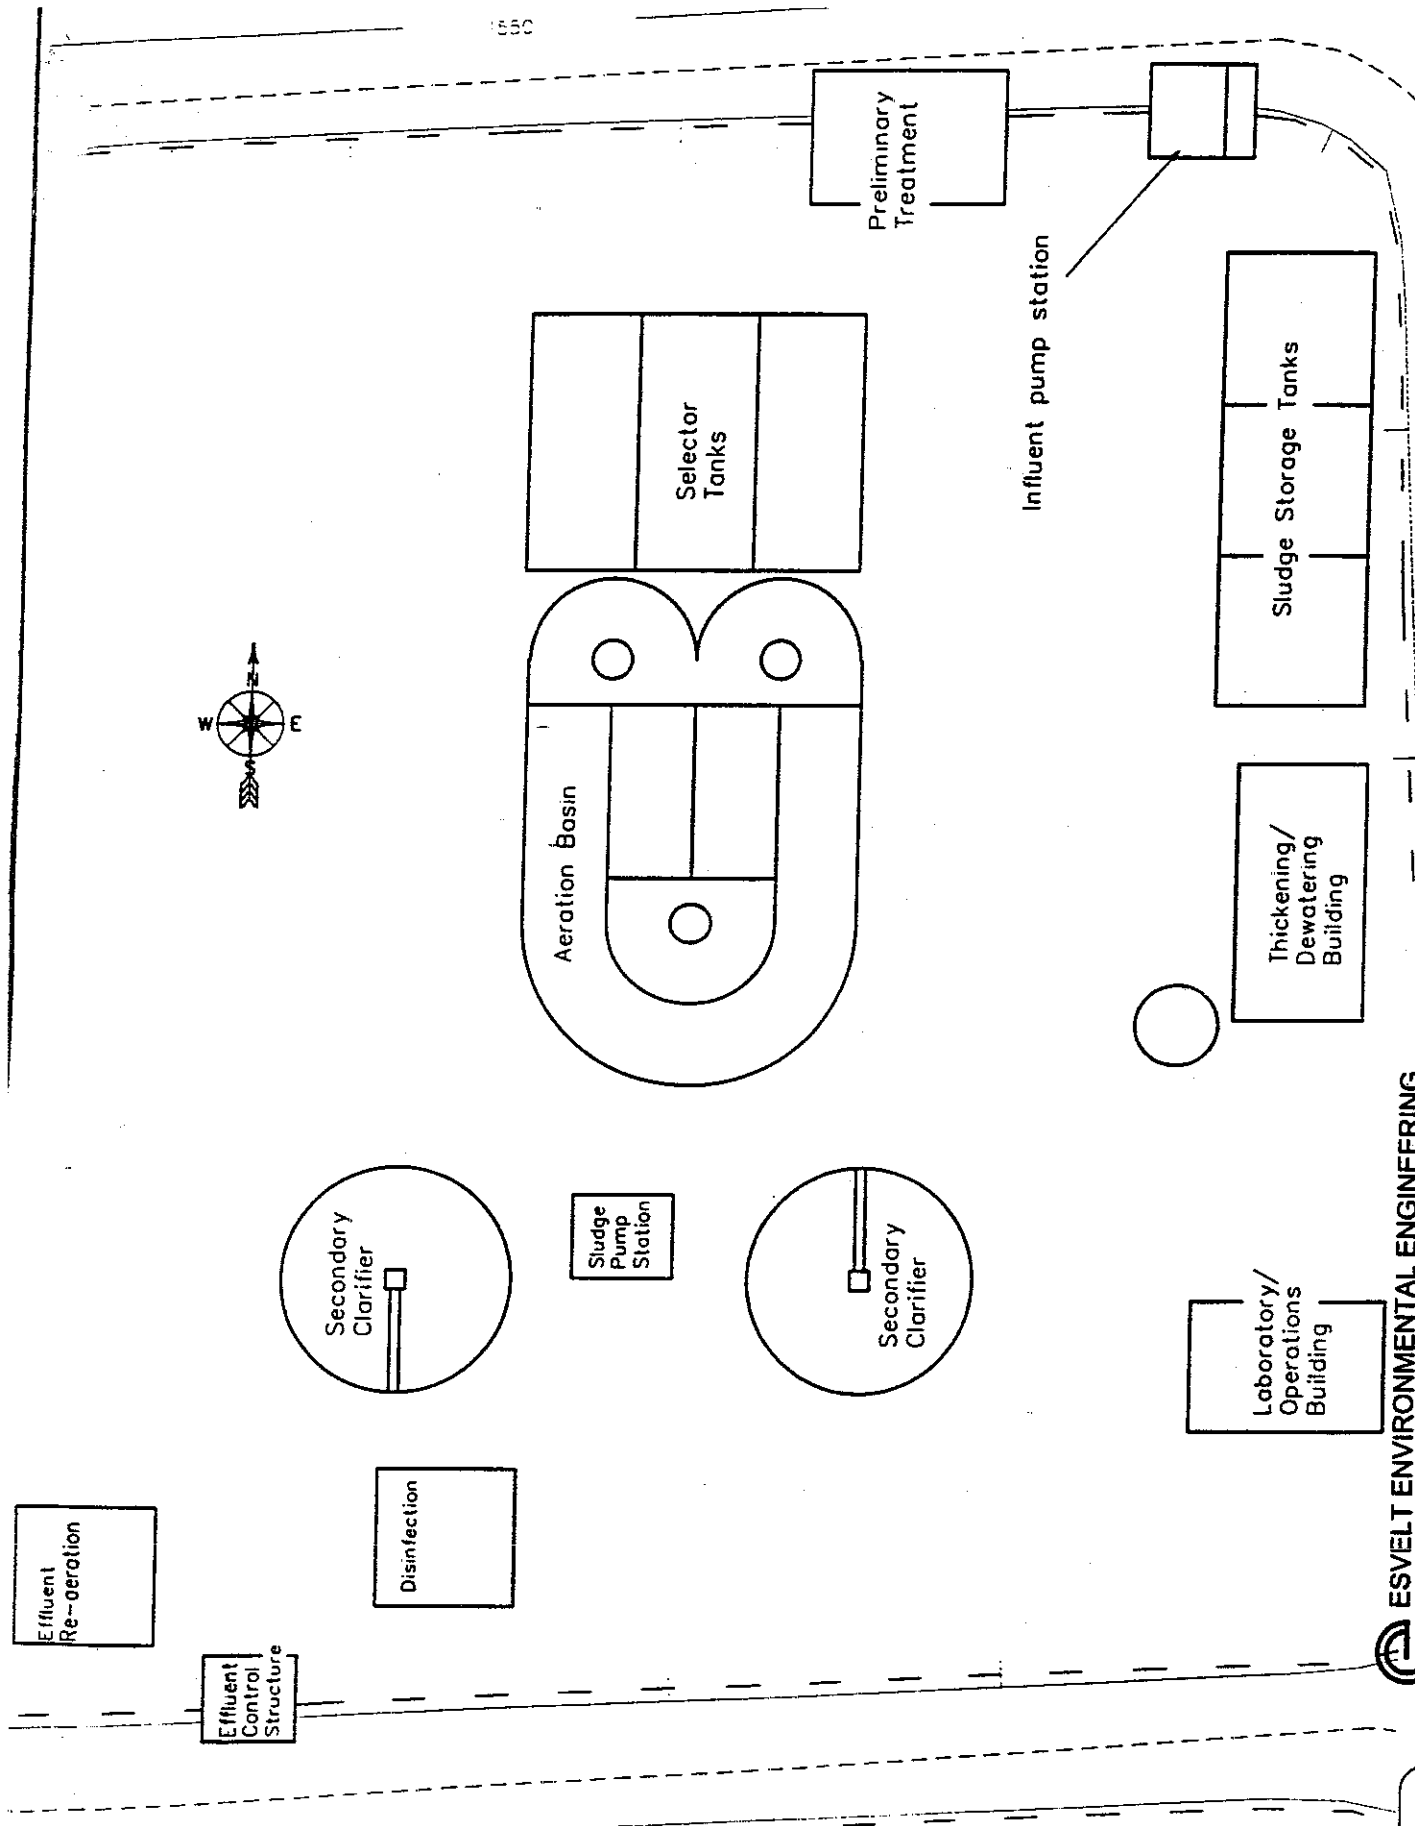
Plant site layout for the new Colville wastewater treatment plant.
